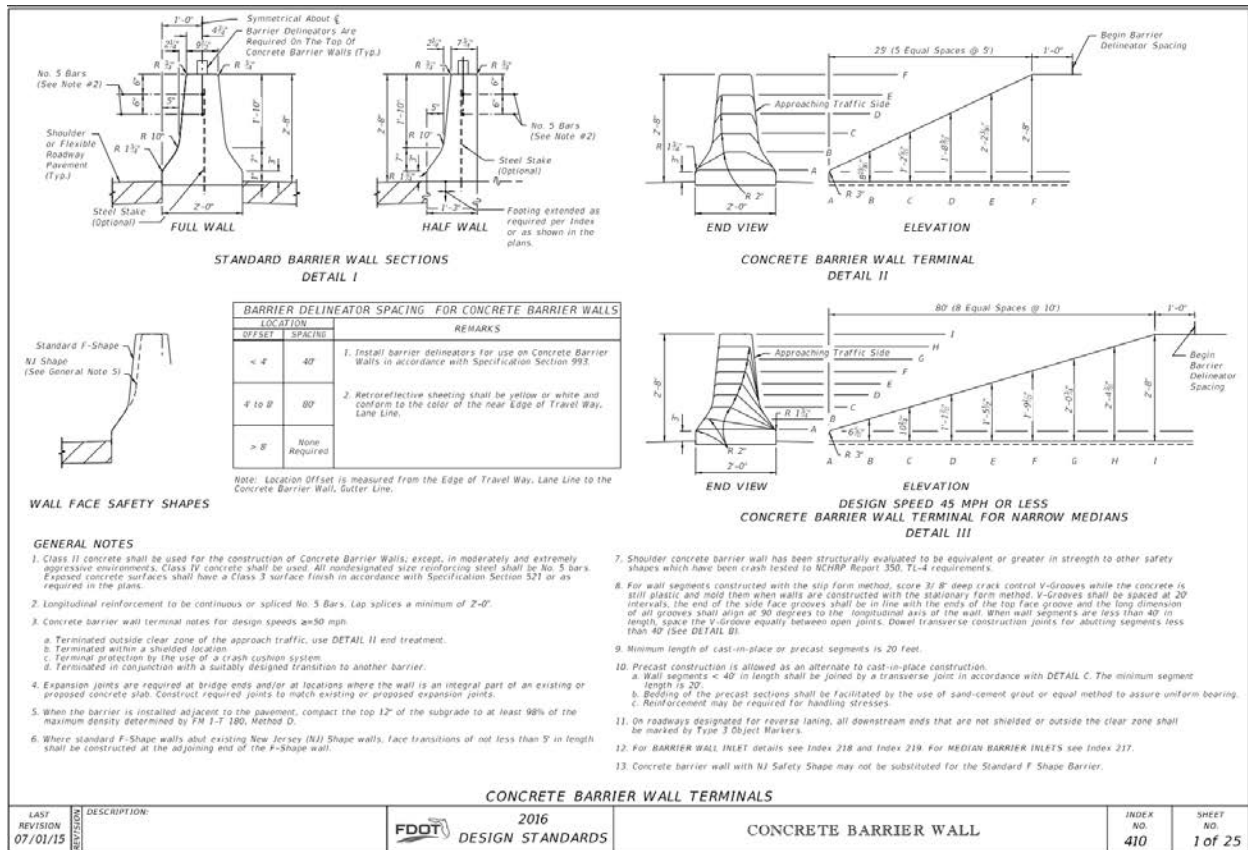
FDOT Standard Plan for Concrete Barrier Wall [23].
